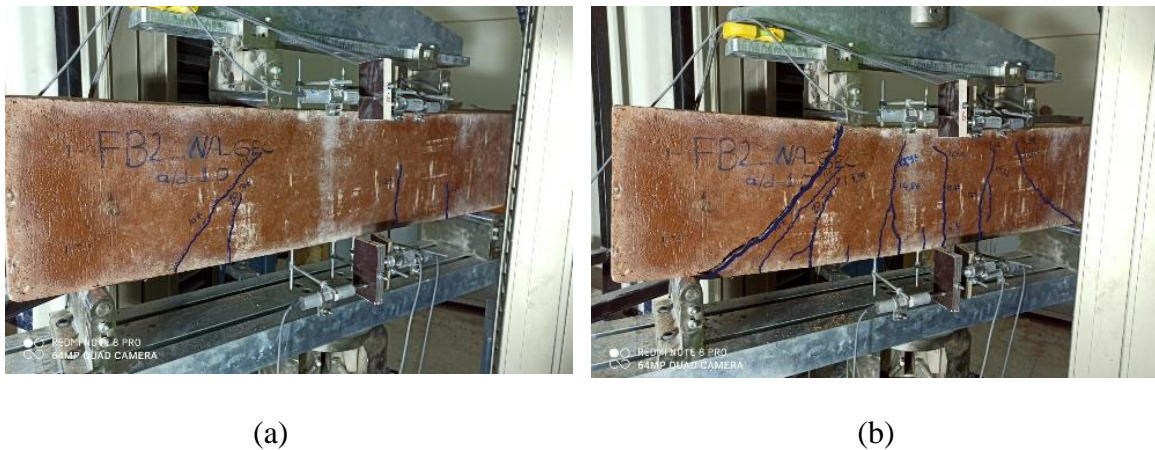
GPC – NA – 1.00 beam, (a) first cracks, (b) failure
